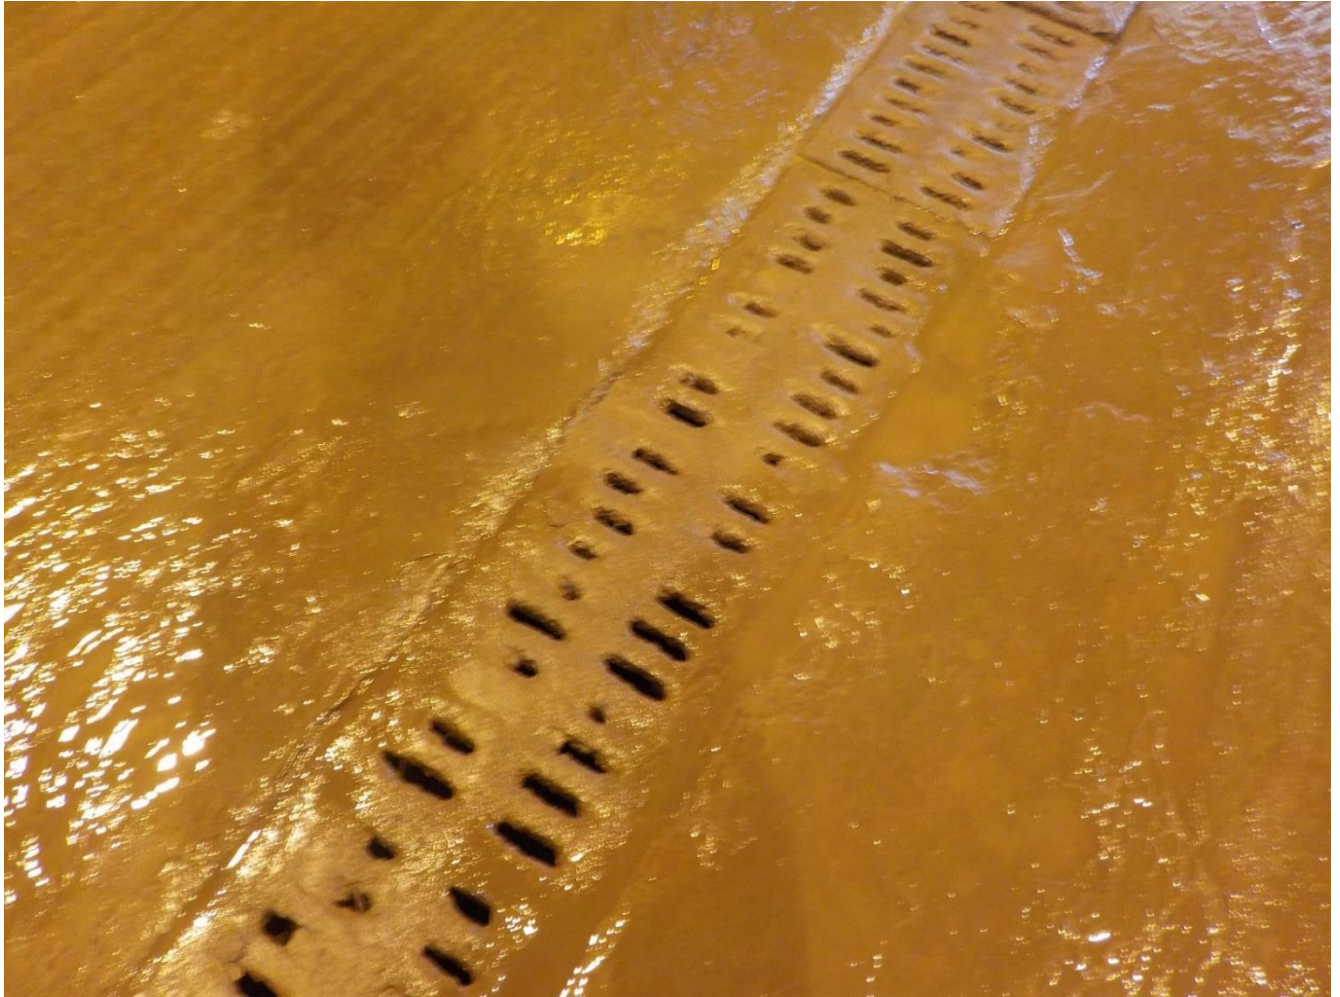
(DSCN0166) This photo shows a close-up view of a portion of the floor drain inside a truck wash bay in Building 624.. See also Photo 28.
